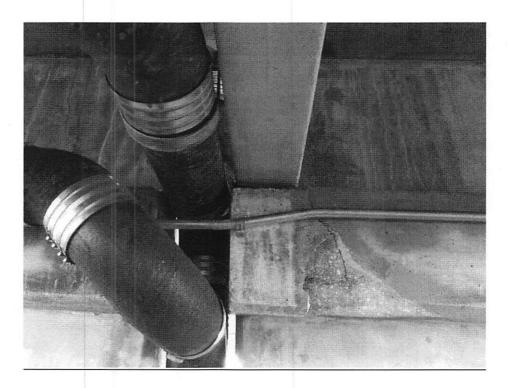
Cracked Haunch below third floor joist.
